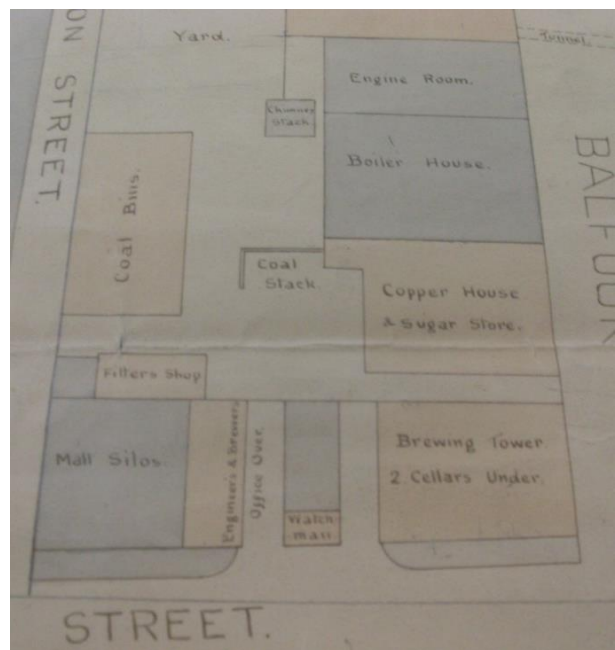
Portion of 1930 block plan by Office of the Engineer in Chief, Kent Brewery, Plan No. K2 dated 22-05-30
